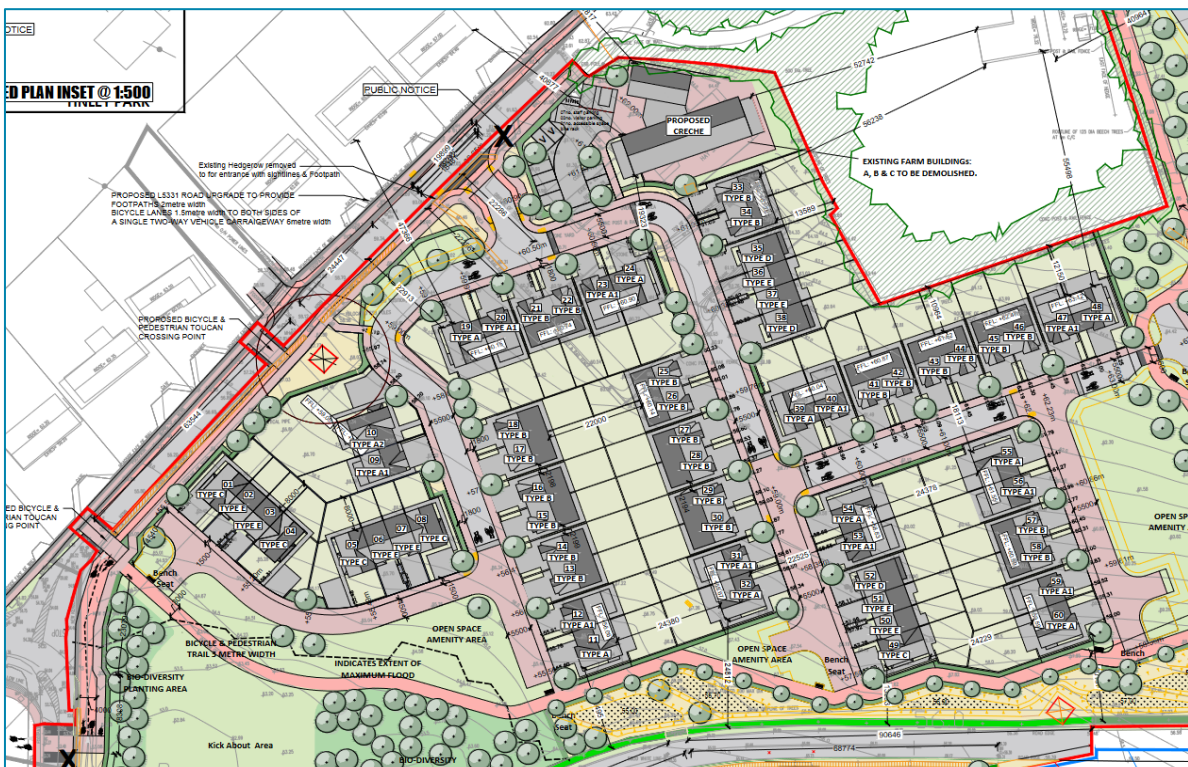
Proposed Access Arrangement [Western portion of site]
